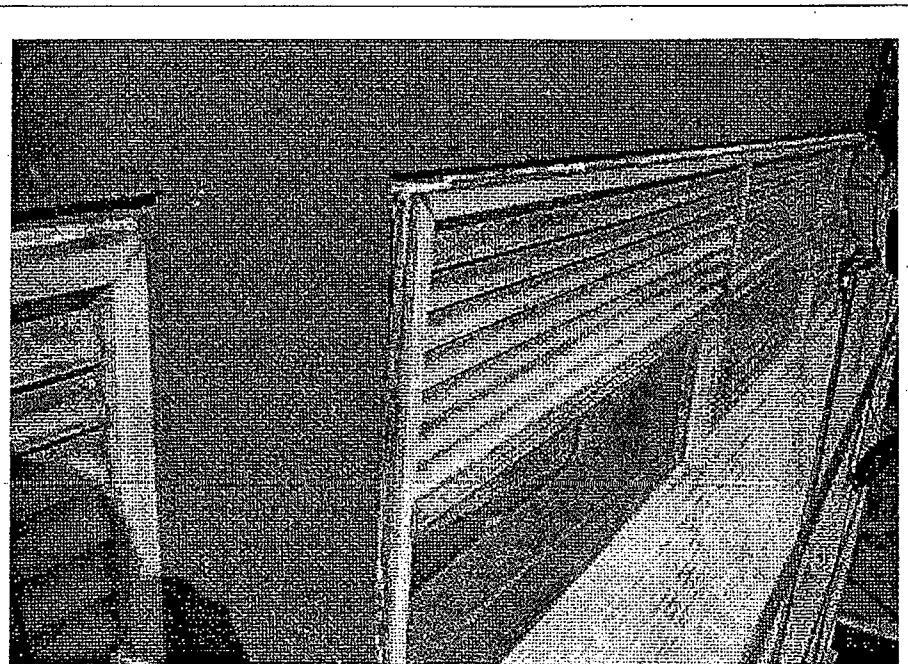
Windows and Louvres – Louvre/Window framing detachment from concrete structure and surface corrosion of louvres.
